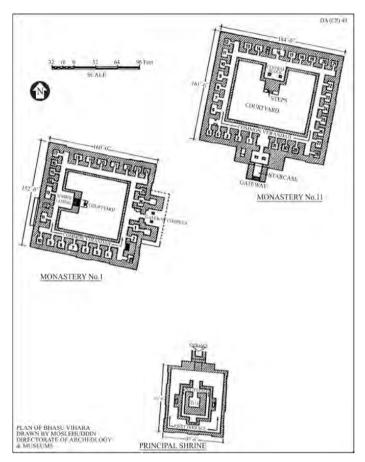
Basu Vihara ground floor plan, (c 7th or 10th-11th century)
